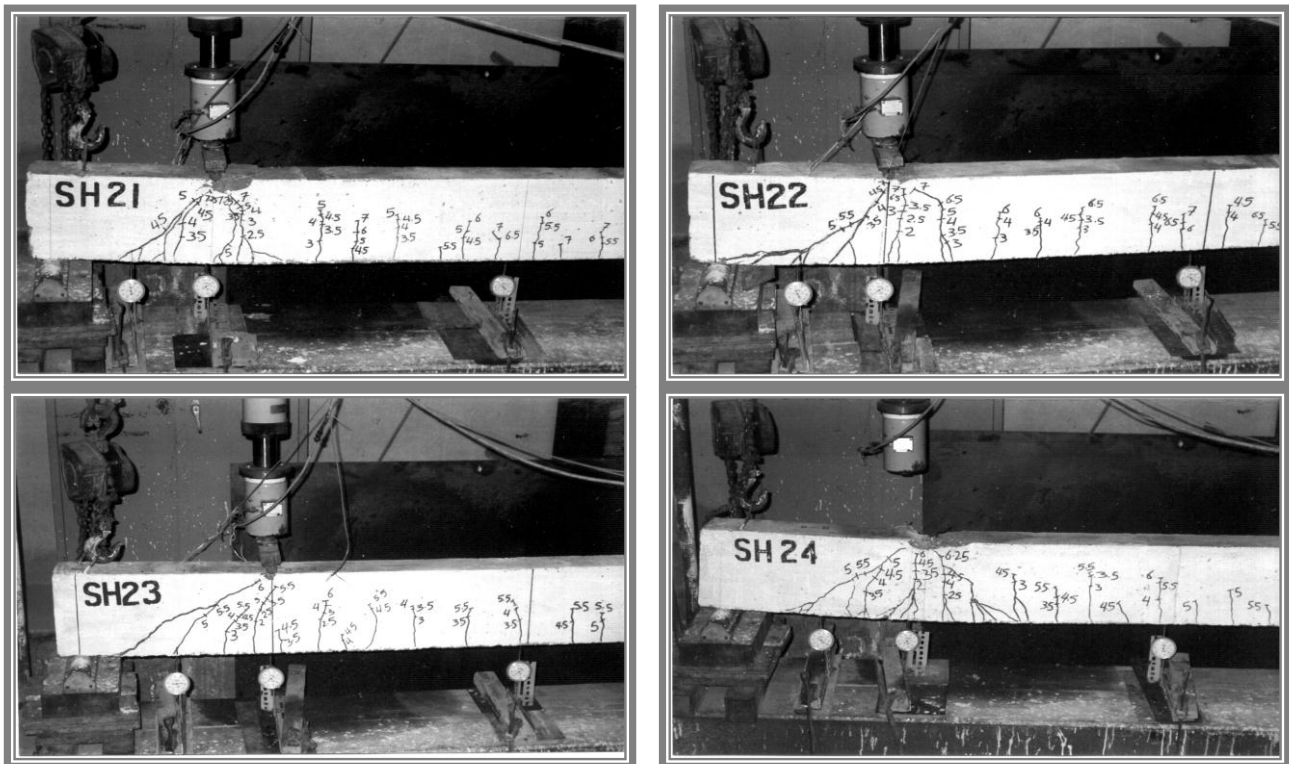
Cracking patterns after failure for tested high strength concrete beams with stirrups in group "H4".
